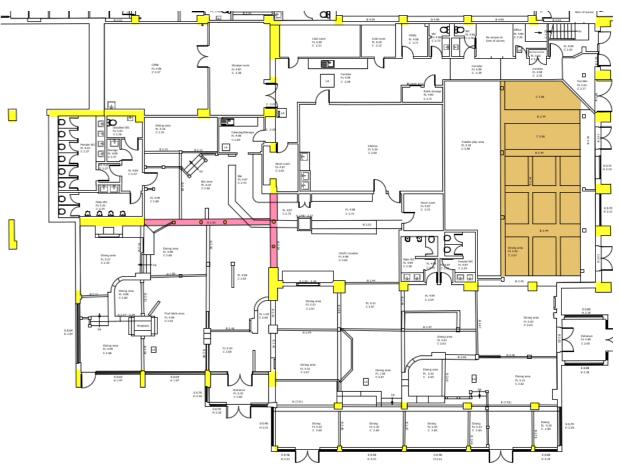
Existing Layout of Royal Hall Highlighting Load Bearing Elements and Structural Modifications
